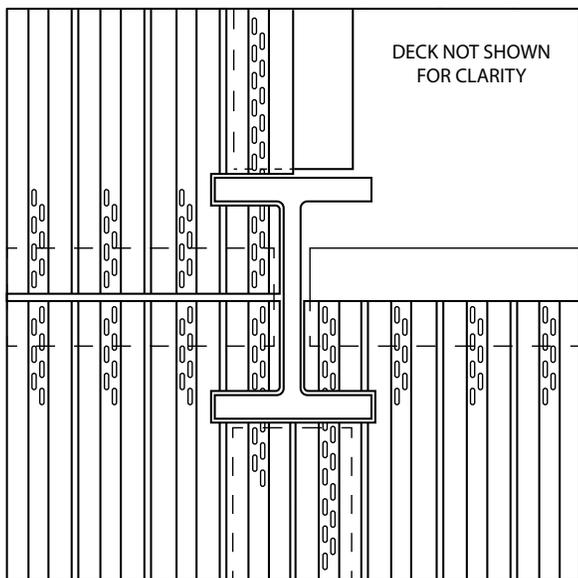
DECK ON OPEN WEB STEEL JOISTS AND OPEN WEB STEEL JOIST GIRDER
